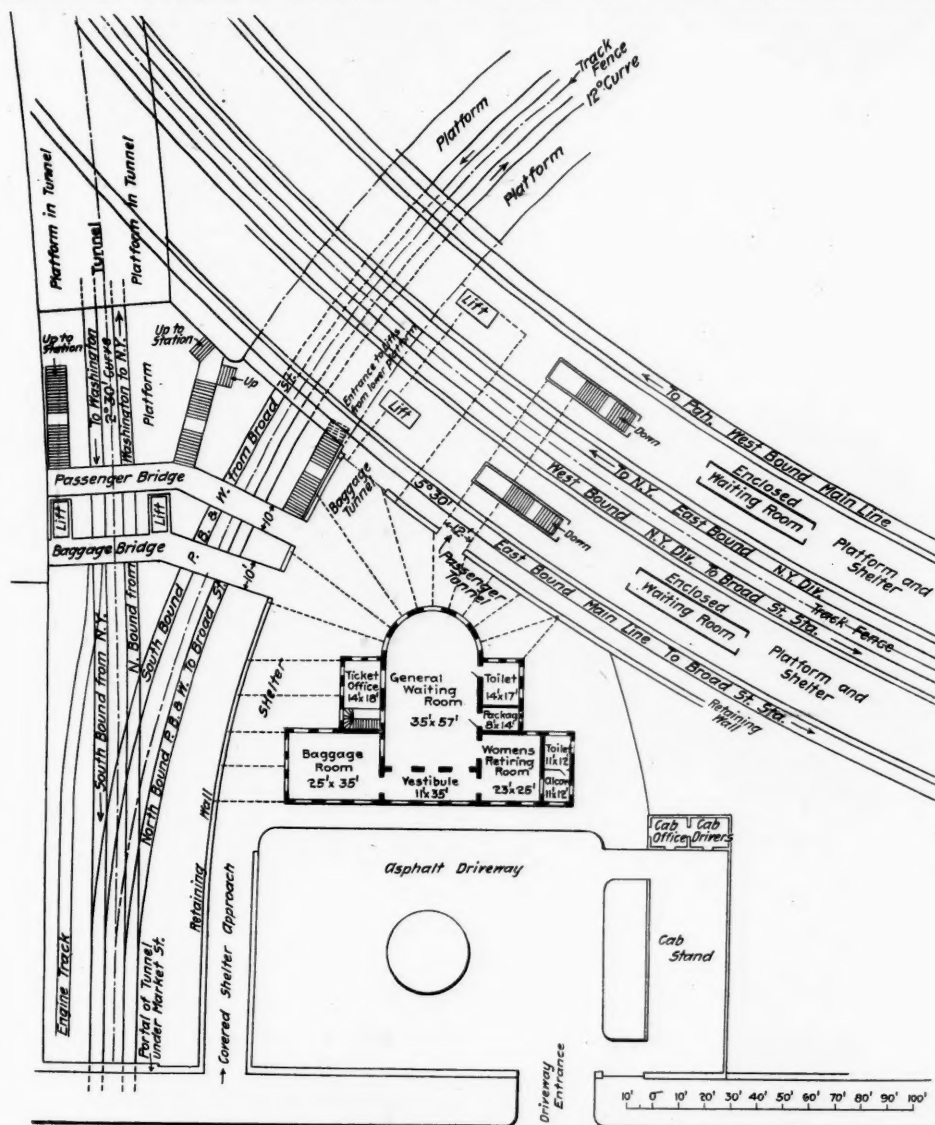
Arrangement of Tracks at Thirty-second Street Station—West Philadelphia.
